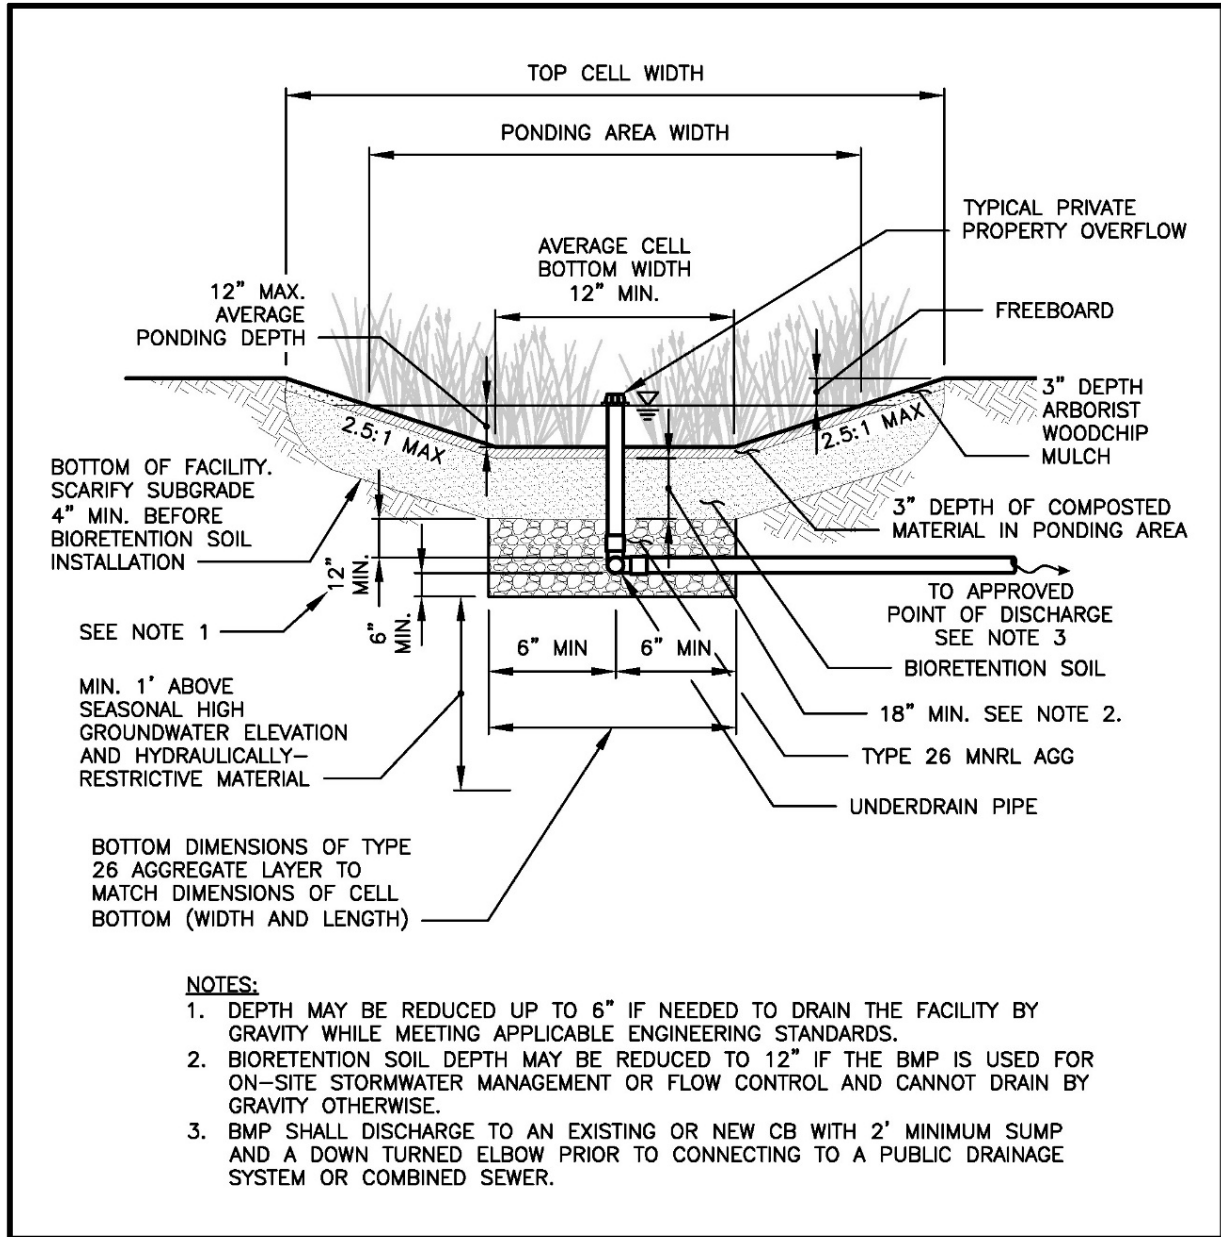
Infiltrating Bioretention Facility with Sloped Sides (with Underdrain).
